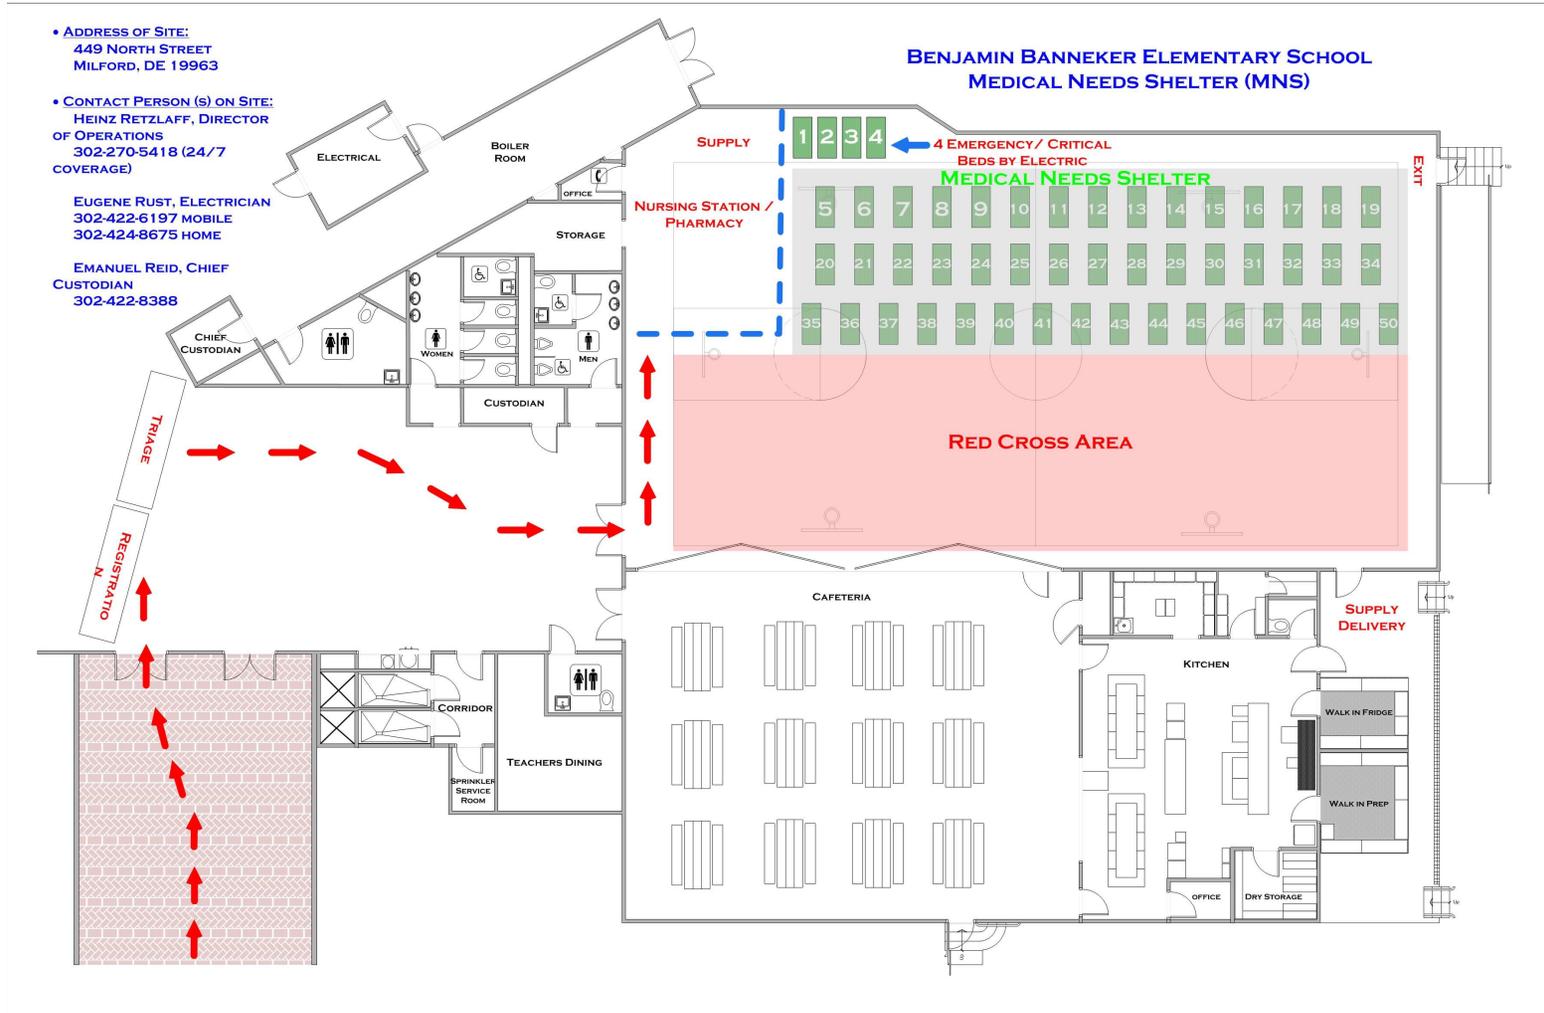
Benjamin Banneker Elementary School MNS: Existing Floor Plan
